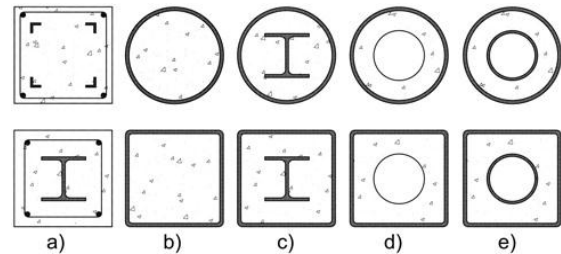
Various types of composite columns: concrete encased steel (CES) (a), CFST (b), combination of CES and CFST (c), hollow CFST sections (d) and double skin sections (e).
